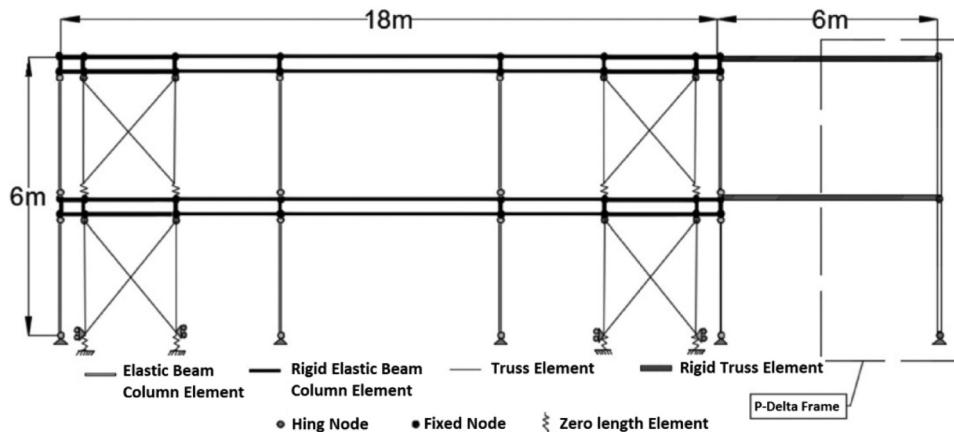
2D Schematic of a braced bay in residential building [77].
